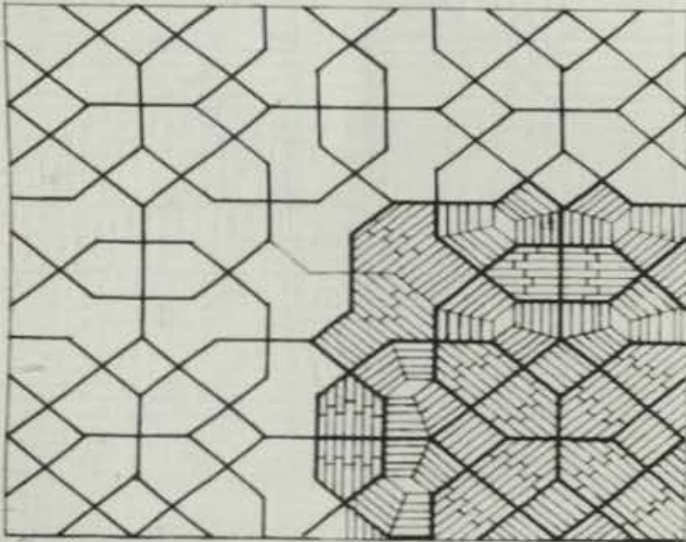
Wazir Khan Mosque, Lahore - cut and dressed flooring in geometrical pattern.
